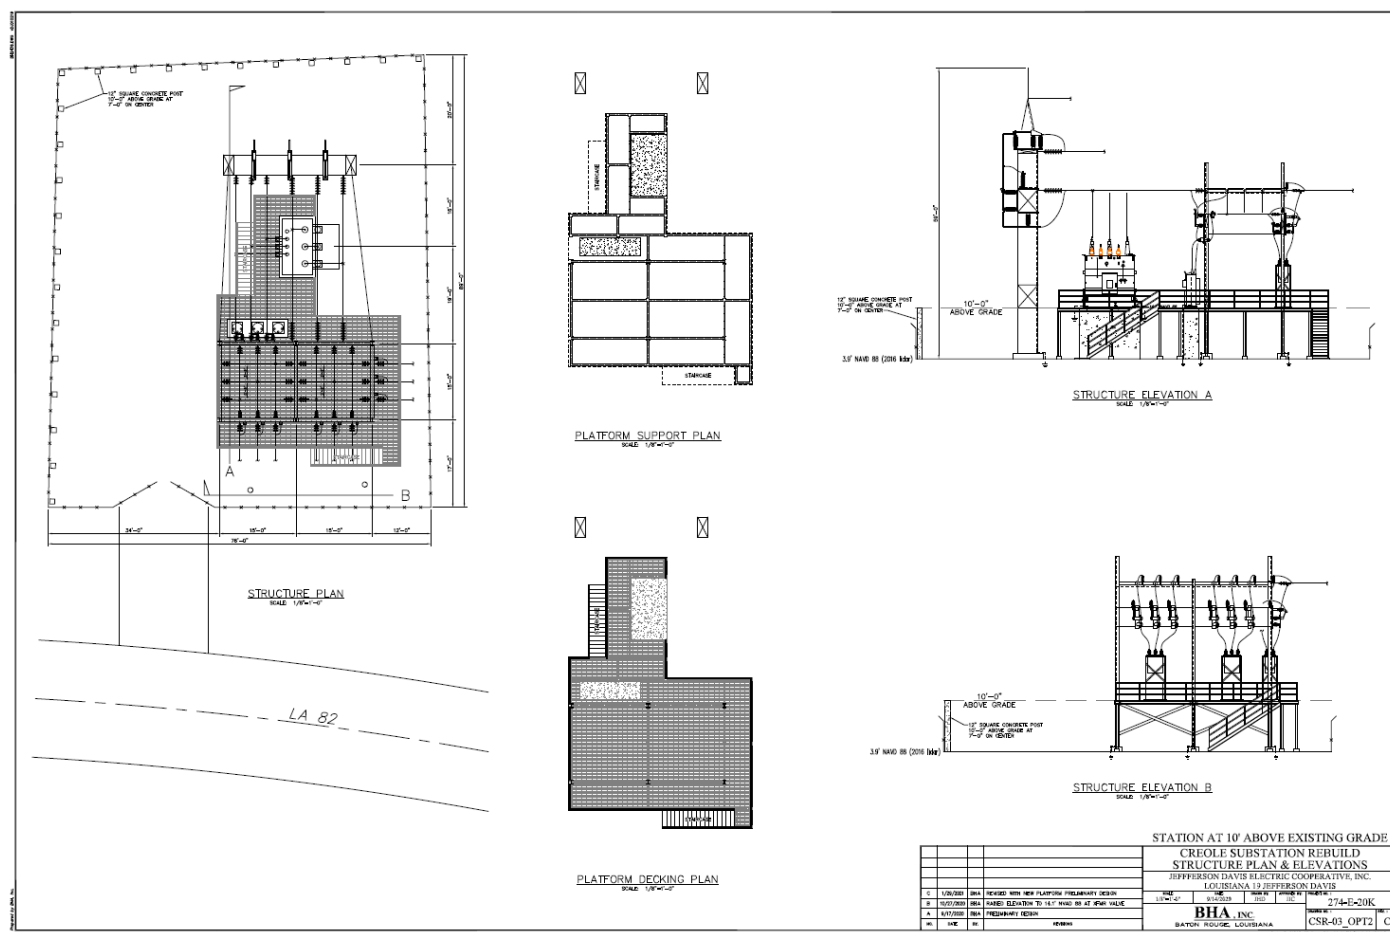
Creole Substation Rebuild Structure Plan (Typical).
